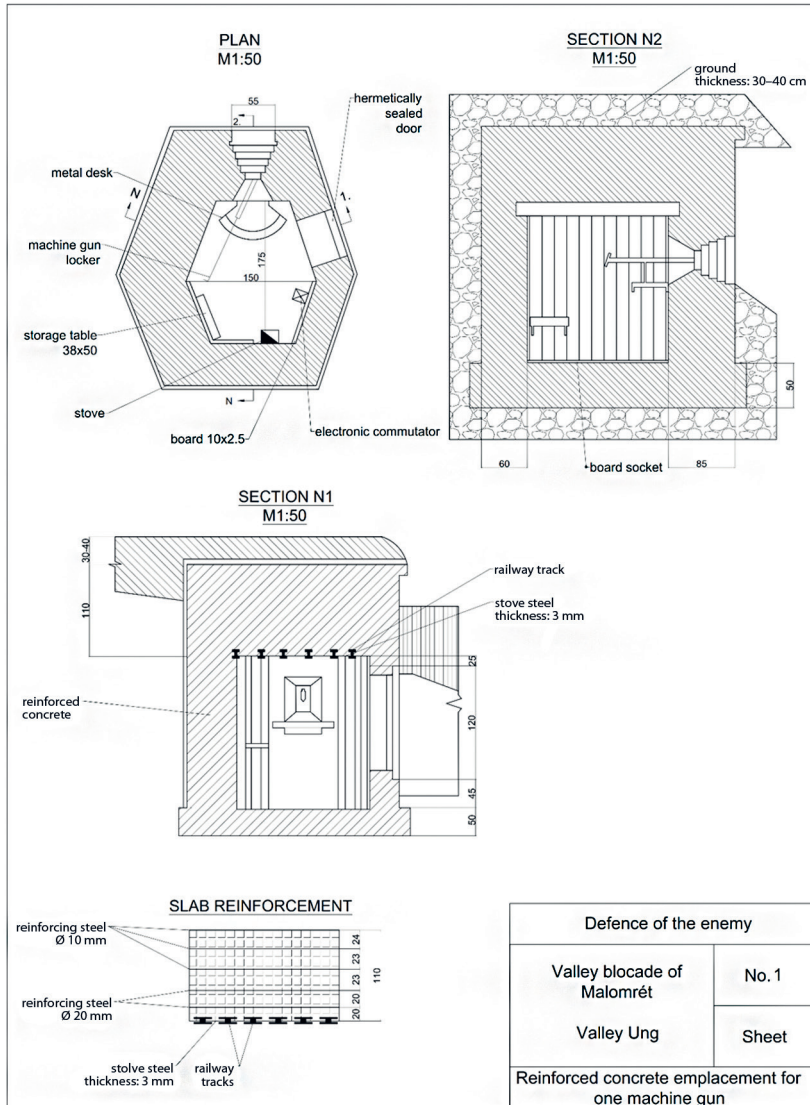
Technical drawing of single-person reinforced concrete firing position (DOT)
